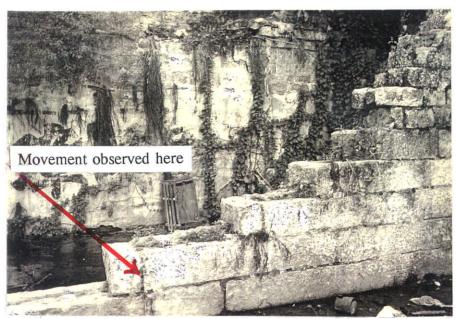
Retaining Wall at Circular Pathway -Details of Movement Observed on the Site at the Crest Platform (II)
